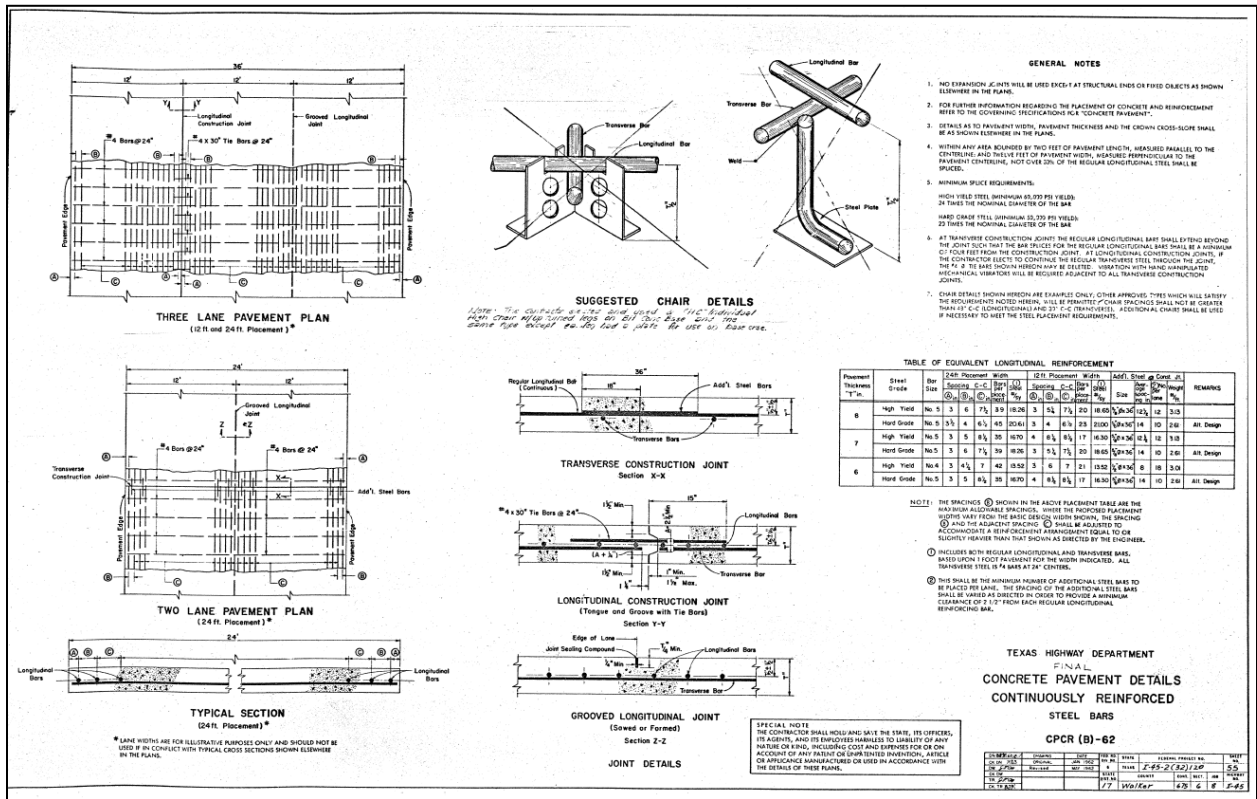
Concrete Pavement Standard (1962) from North of SH 75 to FM 1696.
